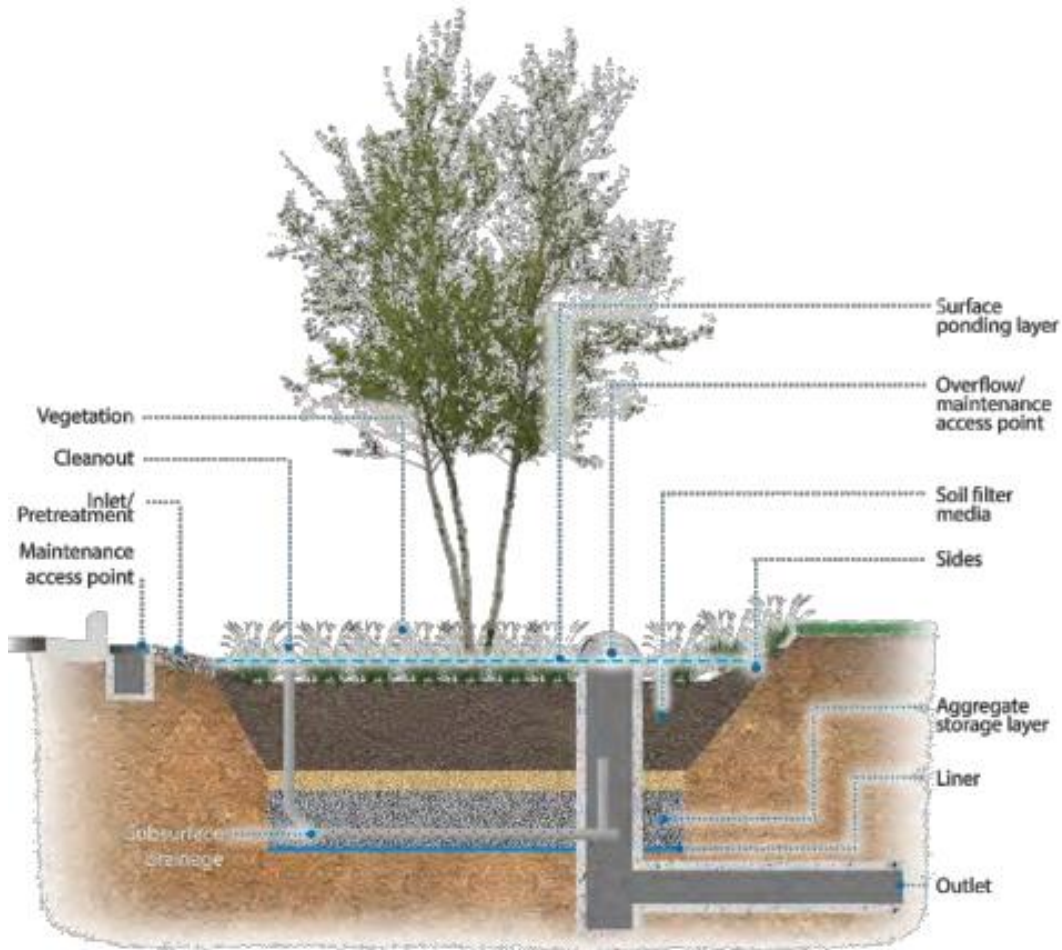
Typical Bioretention Detail (source: DWSD Stormwater Management Design Manual)
